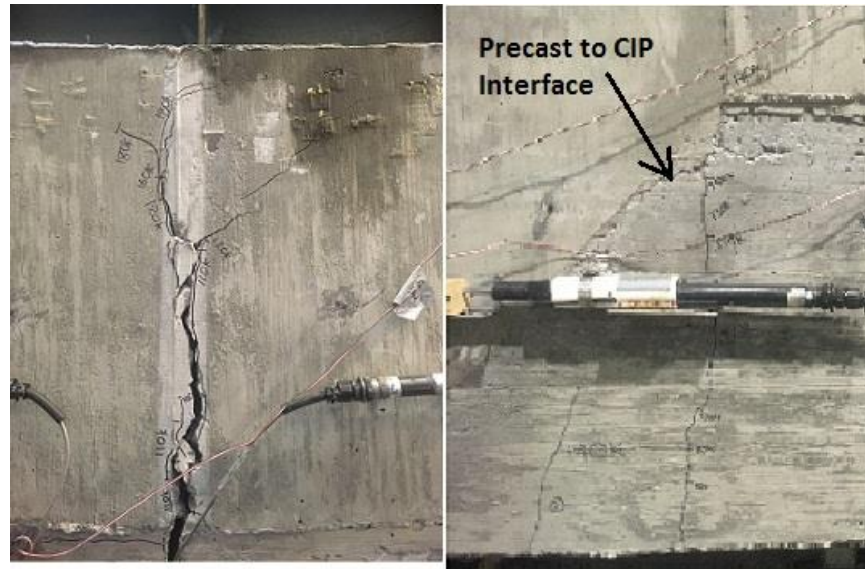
Welded Connection Specimen Cracking at Failure Load of 194 kips (crack at joint left and crack at interface right)
